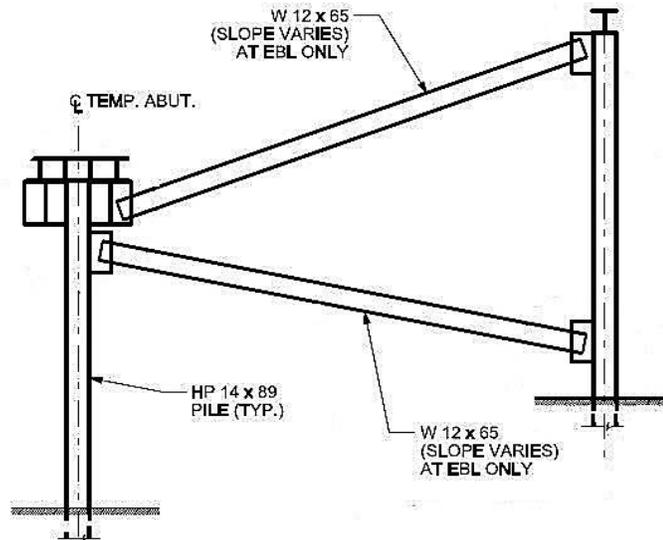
End view of the I-80 Summit Park EB bridge temporary substructure at the abutment and the end of approach with lateral bracing
